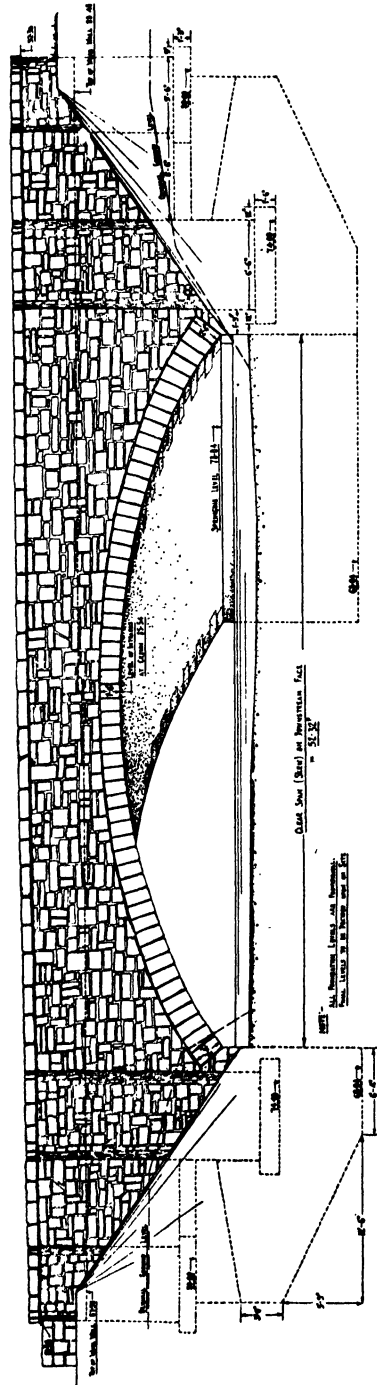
BRIDGEND BRIDGE: ELEVATION OF DOWNSTREAM SIDE.
